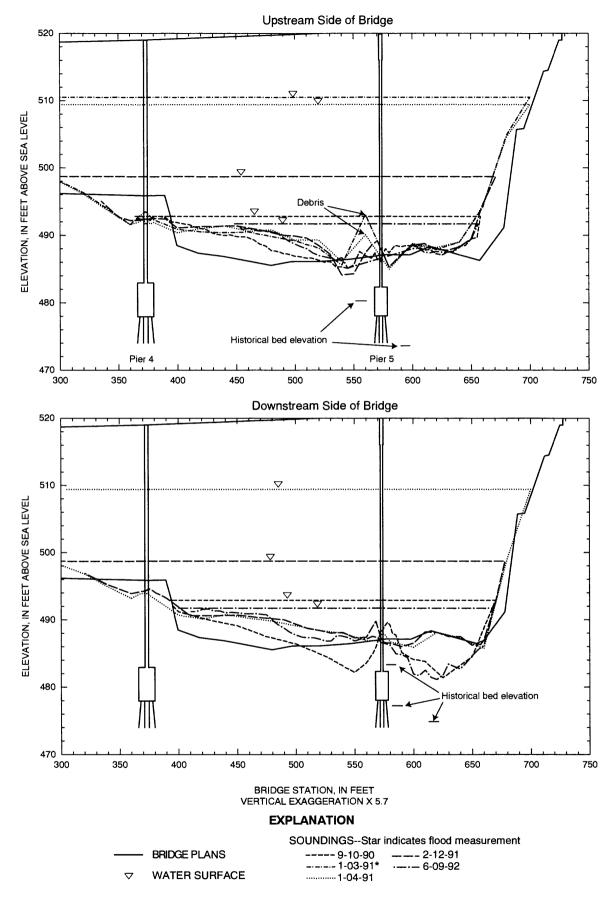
Cross sections showing bed elevations from bridge plans and soundings, State Road 157 over White River at Worthington, Indiana.
